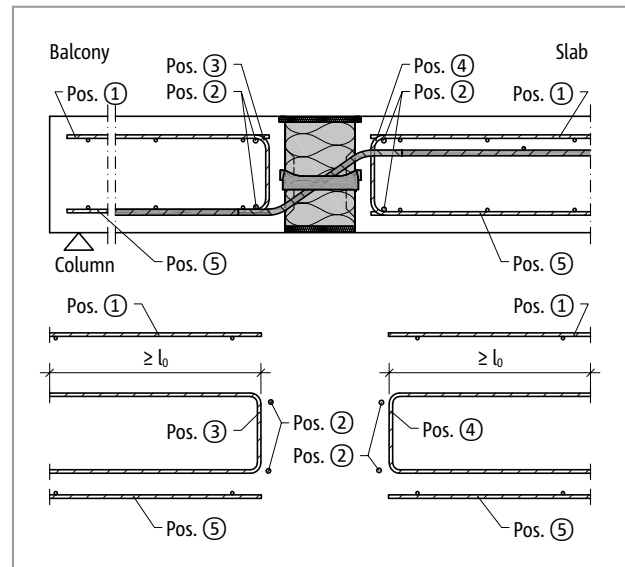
Schöck Isokorb® XT type Q-V5 to Q-V11: On-site reinforcement
